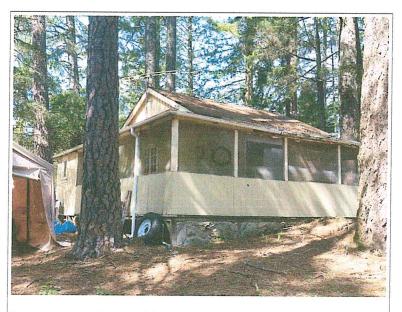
Screened porch additions and enclosure showing rock infill between the post and pier foundation.
